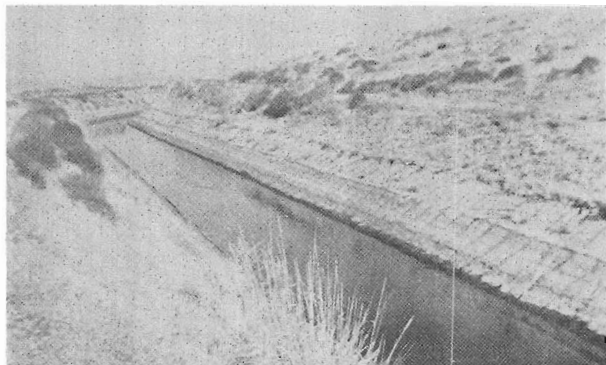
A lining comprised of prefabricated asphaltic blocks. P-3-D-15392.
